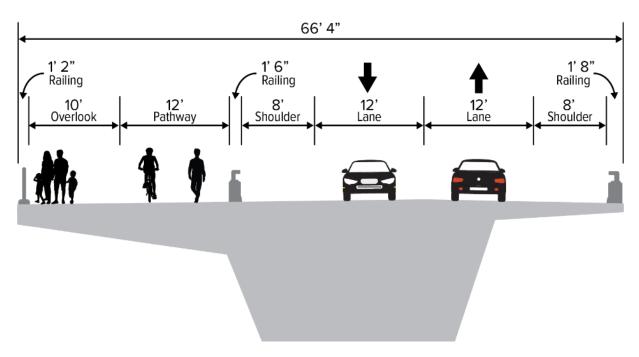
Replacement bridge cross section with pedestrian overlook
